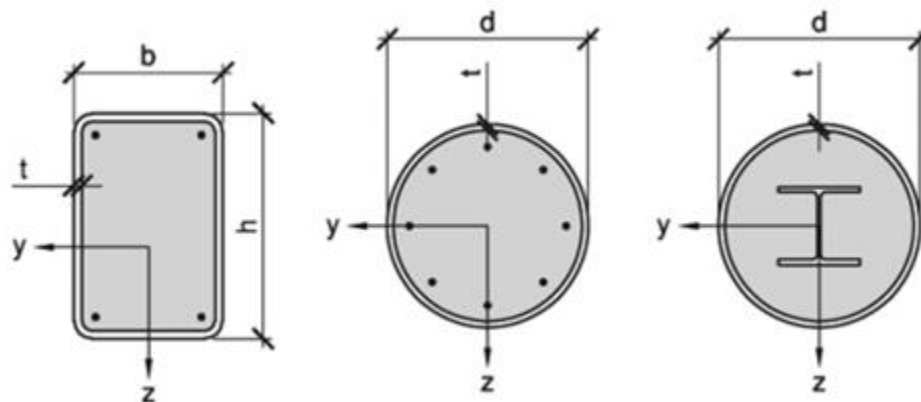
Typical Cross-Section of Composite Columns with fully or partially Concrete filled Hollow sections. (Source: Buick Davison, 2012)
